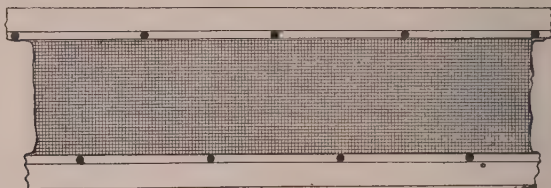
Narrow avenue, showing trees planted alternately about 45 feet apart.
